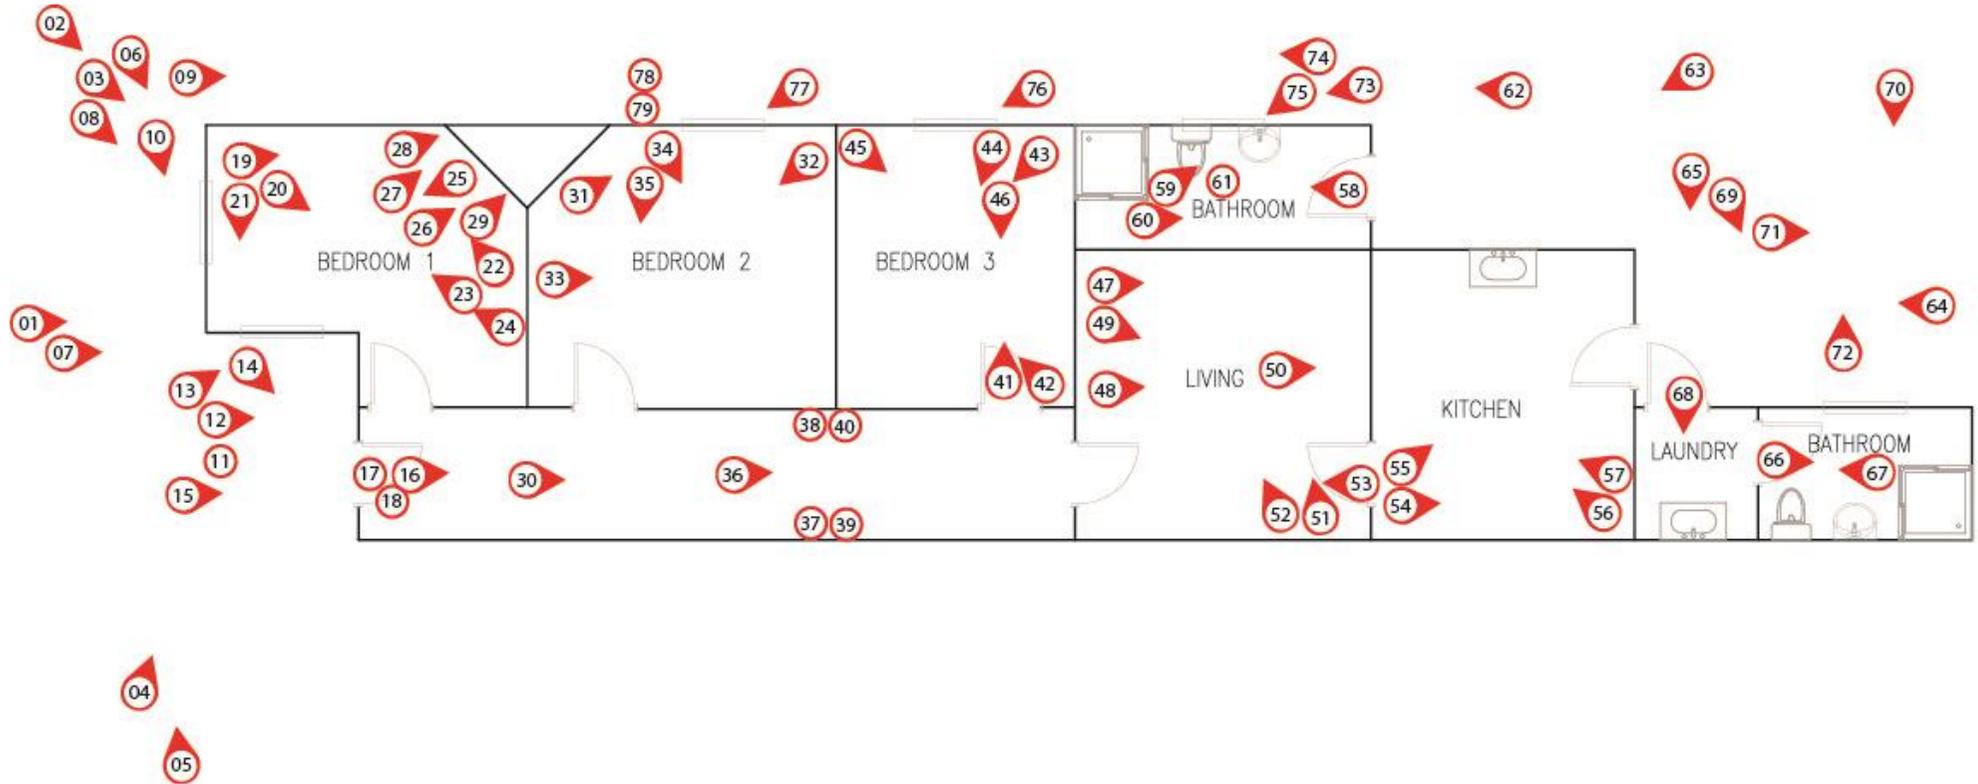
Direction Plan of Ground Floor of 264 Victoria Road, Rozelle.
